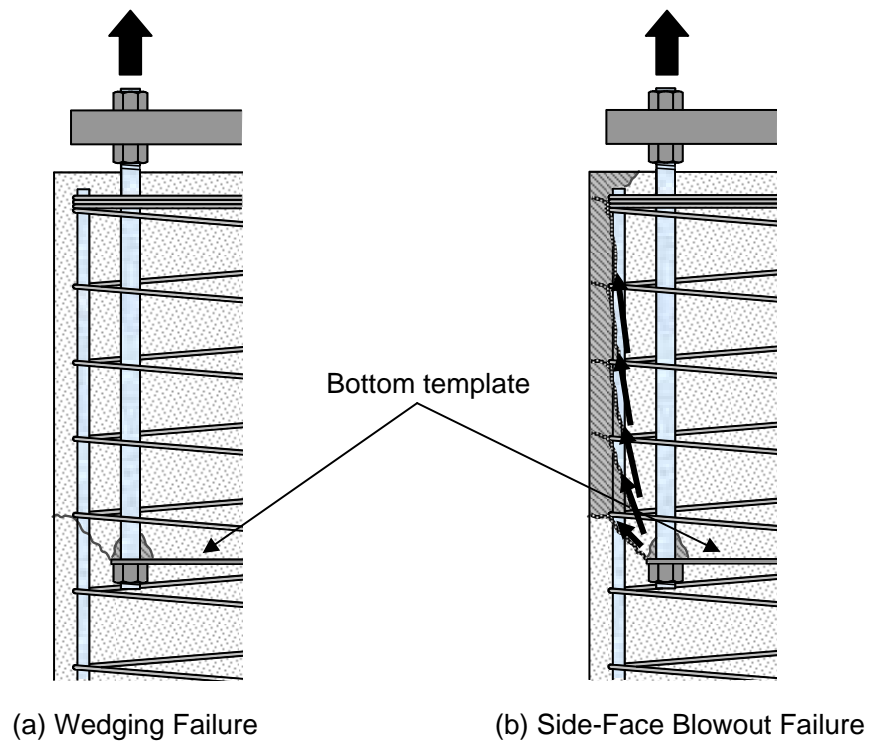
Tensile Failure of Anchor Bolt
